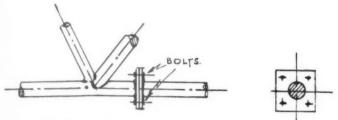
DETAIL. JOINT FOR SMALL SPANS
